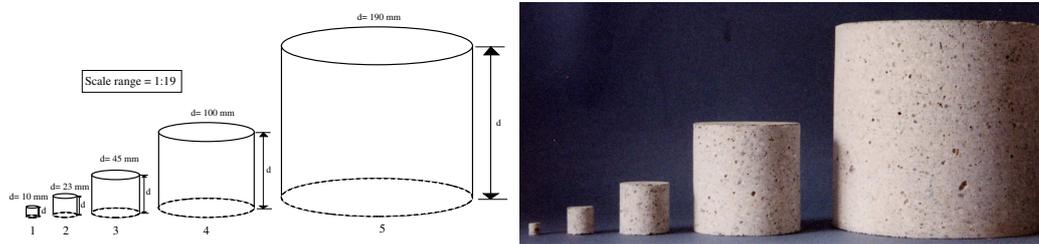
(a) Geometries of the five different concrete specimens; (b) overall view of the five specimen sizes.
